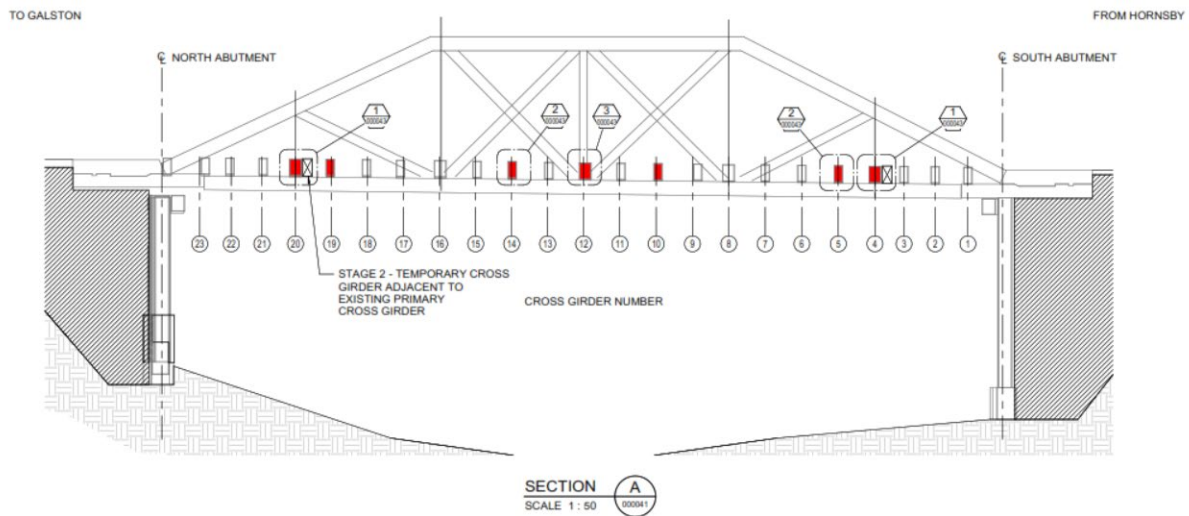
Section indicating cross girders for replacement shaded red. (Source: 520212TP-AURC-B00390-ST-DRG-000041, 100% Design drawings, Aurecon 2023)
